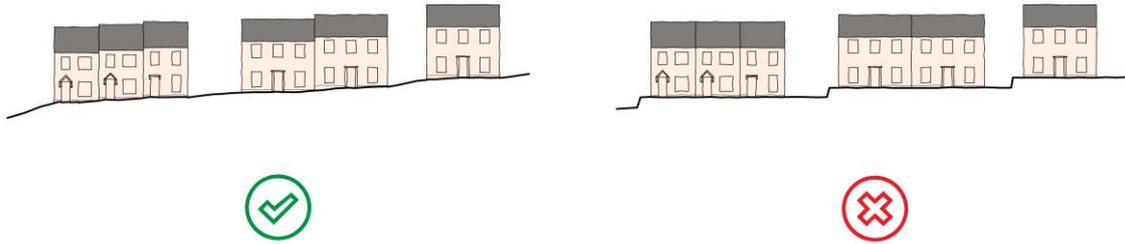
Examples of appropriate and inappropriate approaches to building on a sloped site
